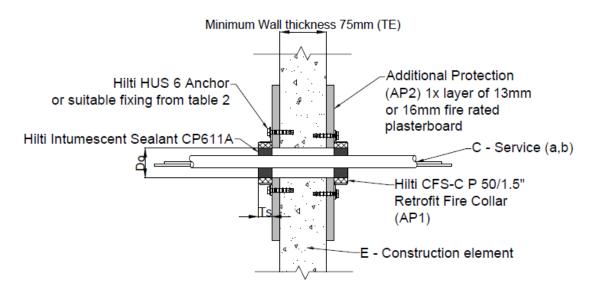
Side view, Seal Type 14, 75mm concrete wall, uPVC Conduits ≤ 40mm OD, CP611a + AP1 refer to table 17
